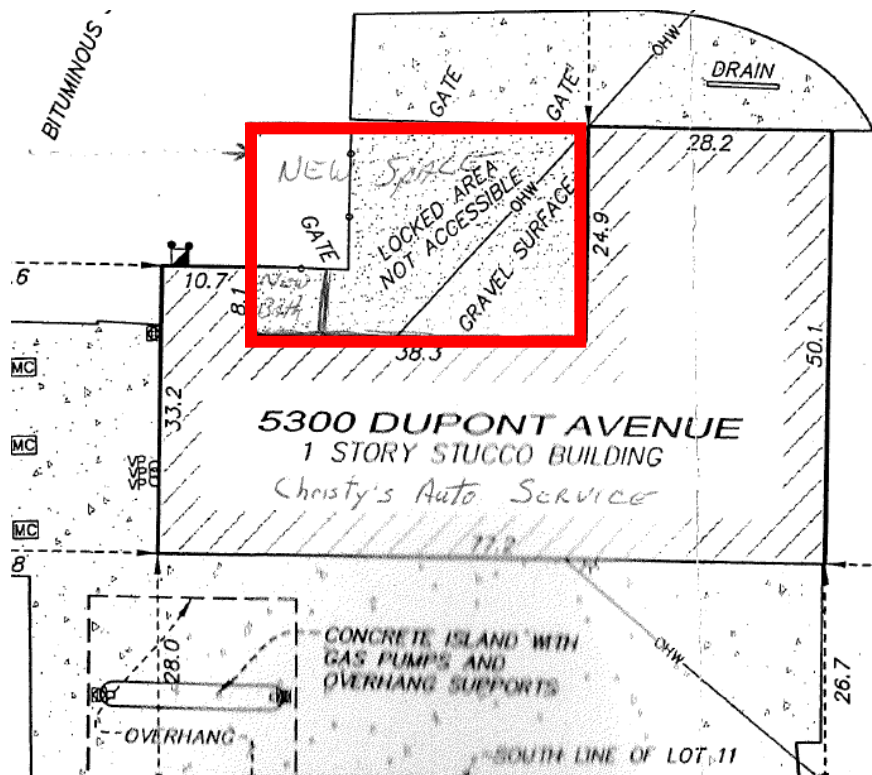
Site Plan of Proposed Addition to Subject Property (Highlighted in Red).
